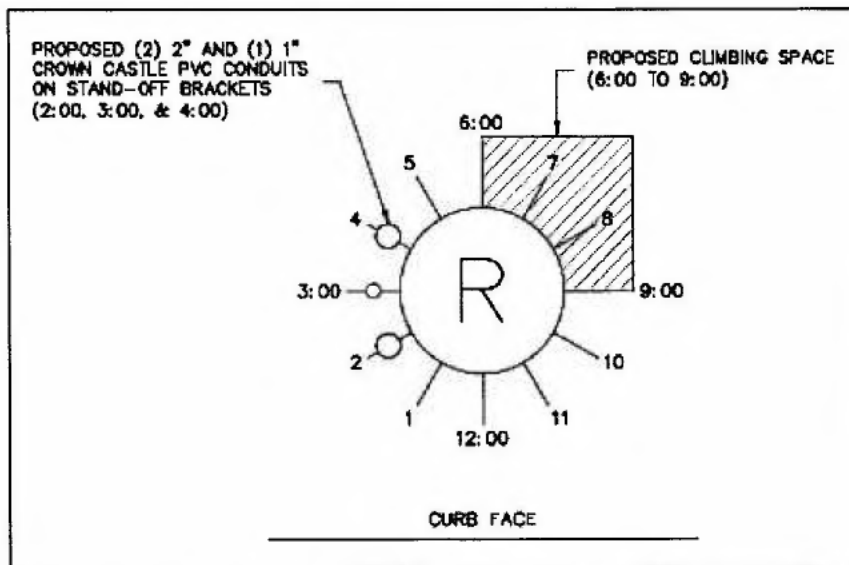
Inverted pole configuration (Source: Plans A-1 Panel 3).
